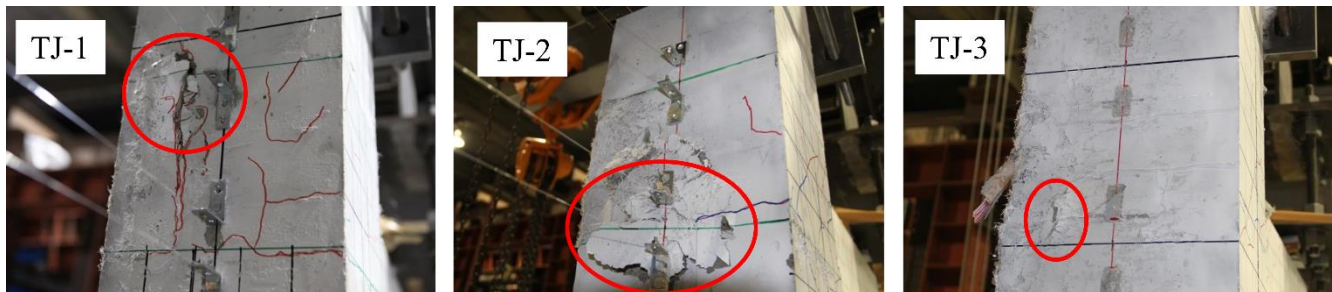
Pull out of beam longitudinal reinforcements after loading tests
